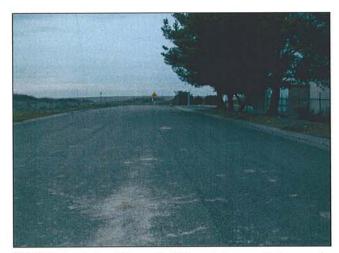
Photo of the end of Sunset Avenue facing west.
